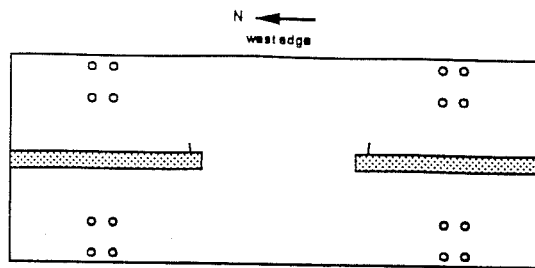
Sp. 2b: Progression of Cracking of Bottom Face of Second Floor Slab at Load Point 67
